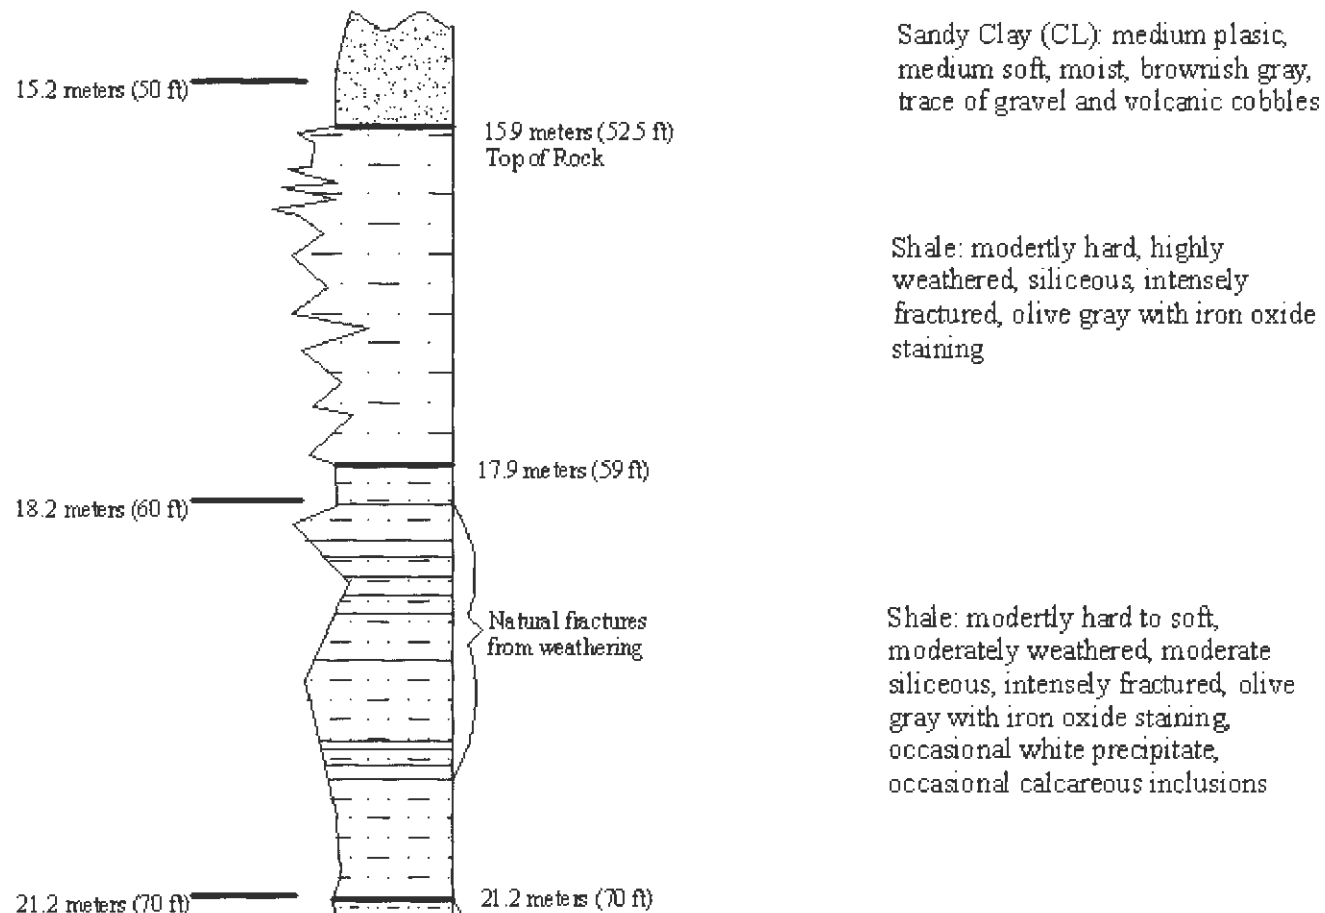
Boring Information: Boring- PZT50/5.42; Location: Oahe Dam, Pierre, SD; Elevation: 475.95 meters (1570.62 ft); Drill Date: June 13-21, 2001
